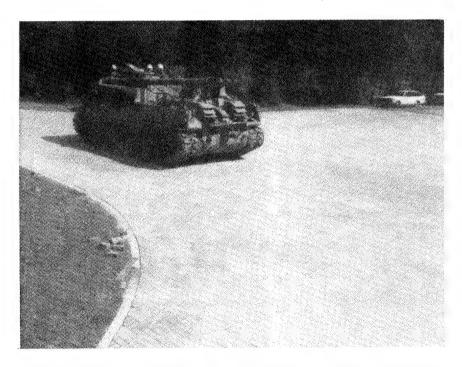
An M-88 Tank Retriever tests the newly installed concrete block pavement at Aberdeen Proving Ground (from Anderton 1991a)
